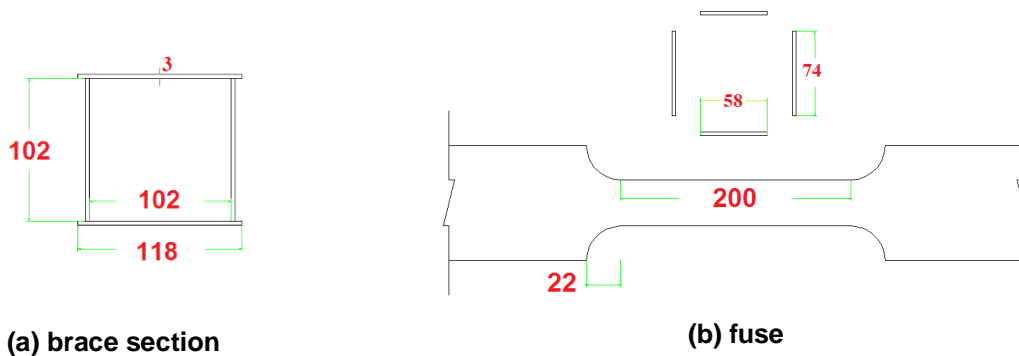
Dimensions of brace section and fuse in experimental models (mm)
